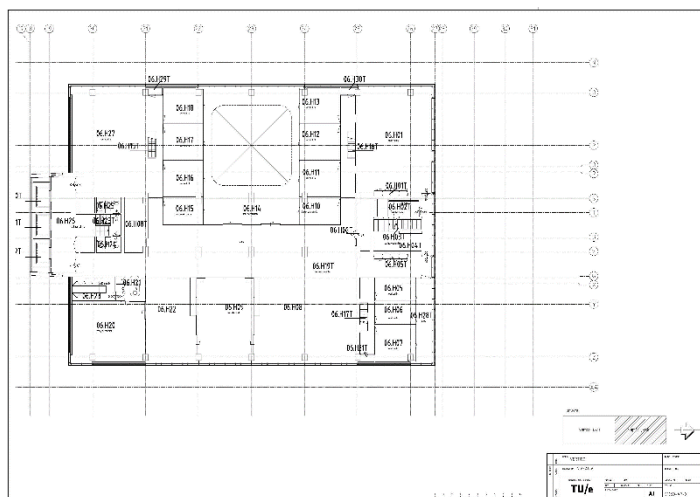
Floorplan of 6th – 9th floor of the Vertigo.
